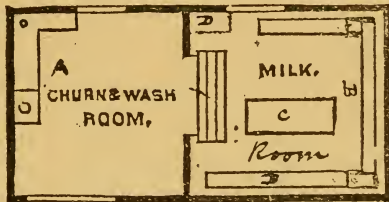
GROUND PLAN OF MILK-HOUSES (Figs. 36 and 37).
